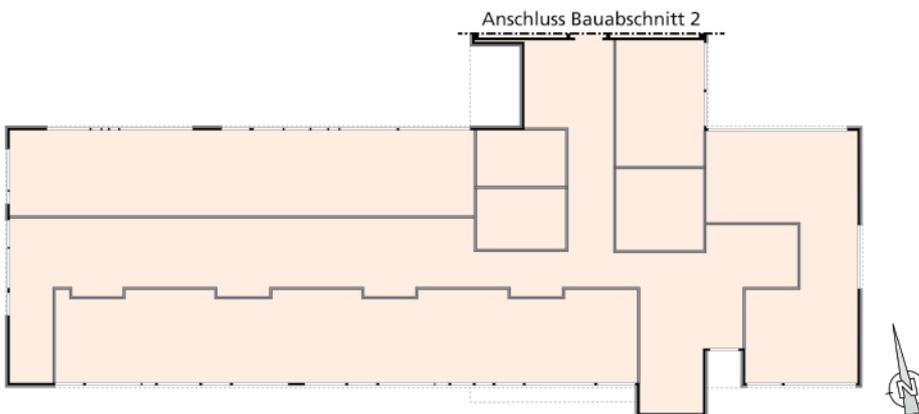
Outline plan of the new build's ground floor, construction segment 1
